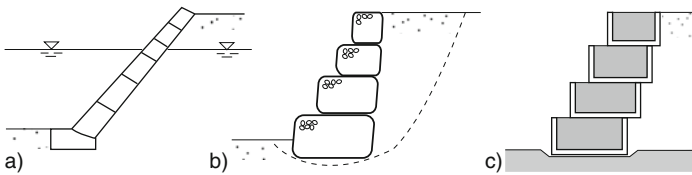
Retaining structures with stones (a), rock-filled bags (b) and earth-filled crates (c)
